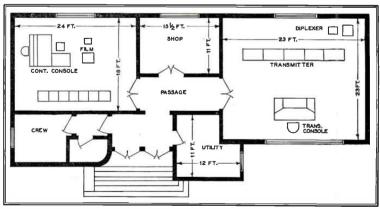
FLOOR PLAN OF THE ORIGINAL WDTV PLANT, UTILIZED FOR NETWORK AND FILM OPERATION
